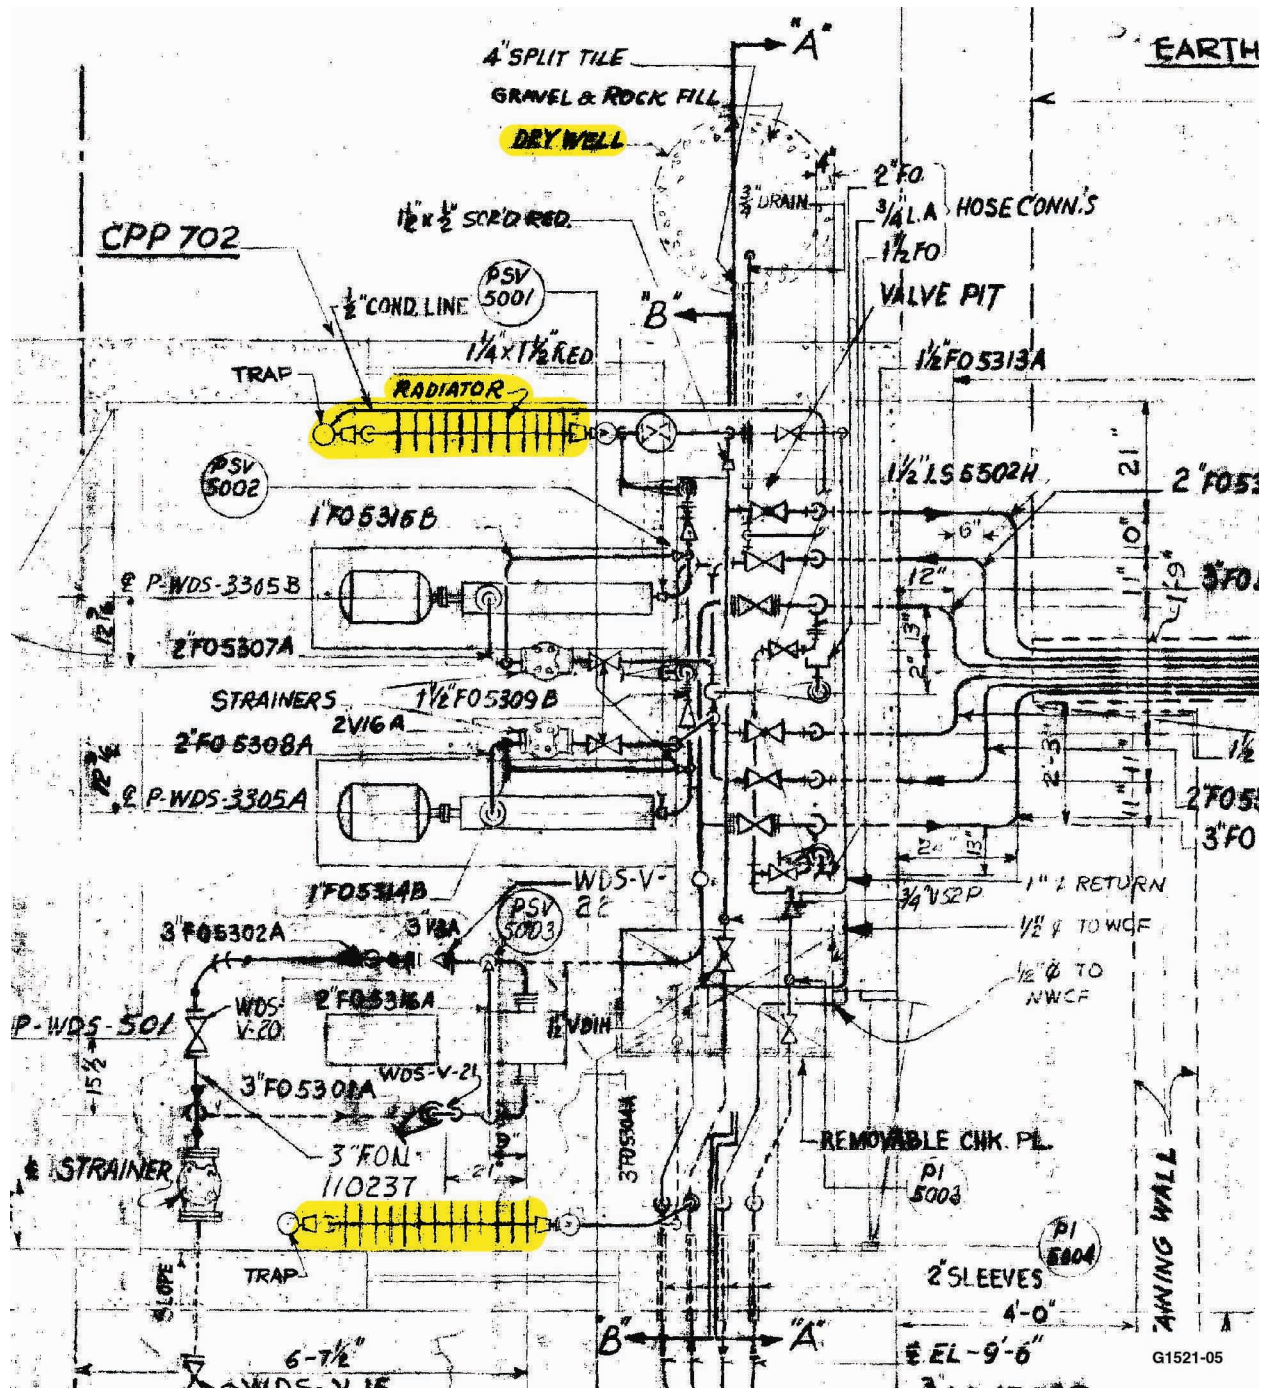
Piping plan for building CPP-702 (from Drawing 103244).
